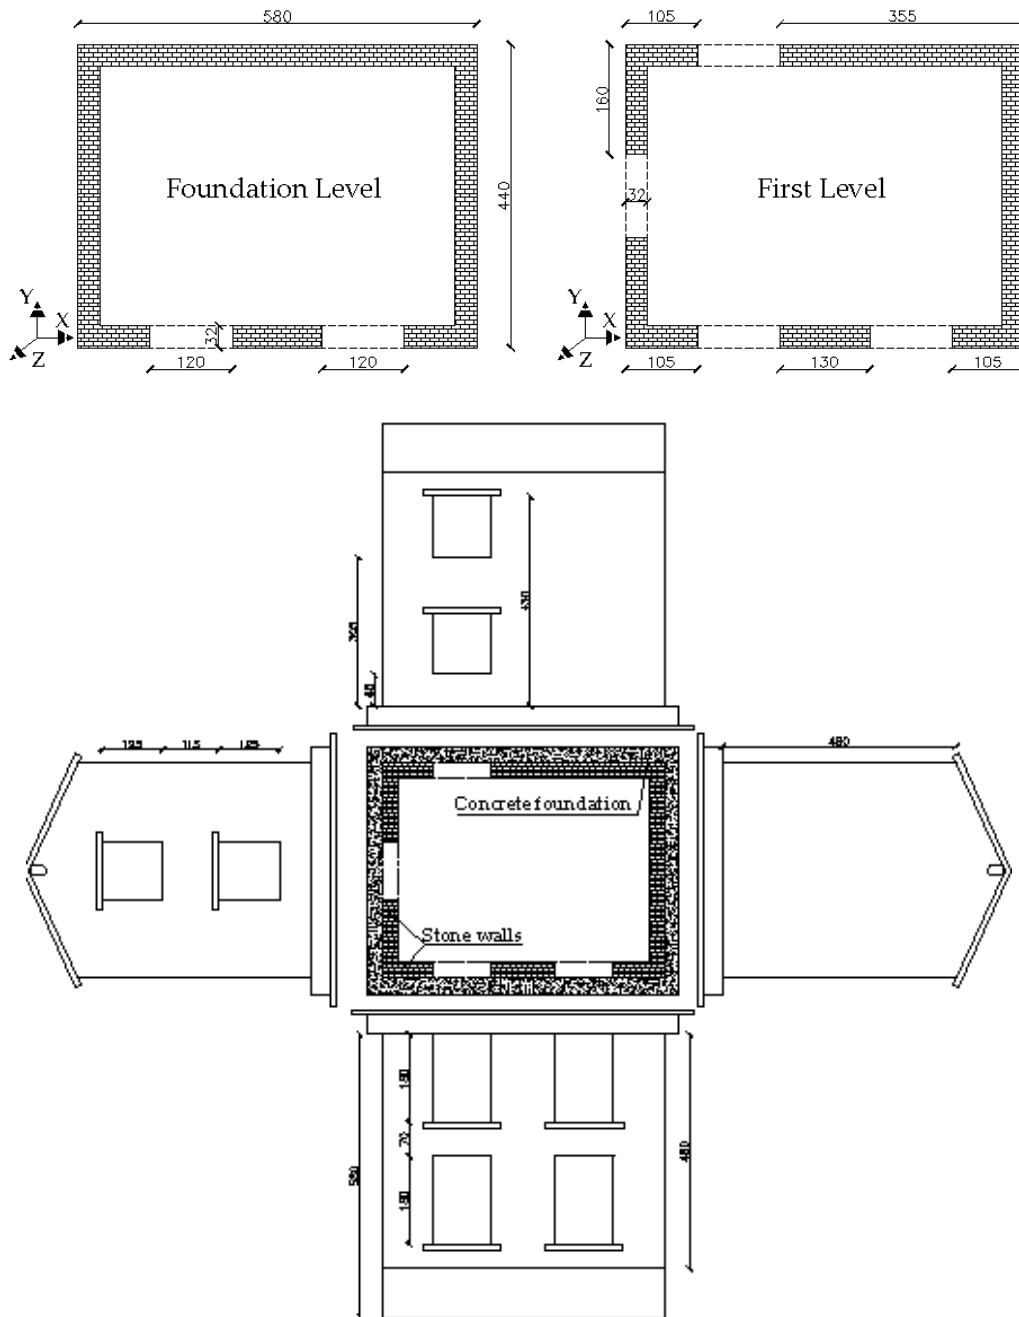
The un-reinforced stone building: plan view (top); sectional view (bottom)
